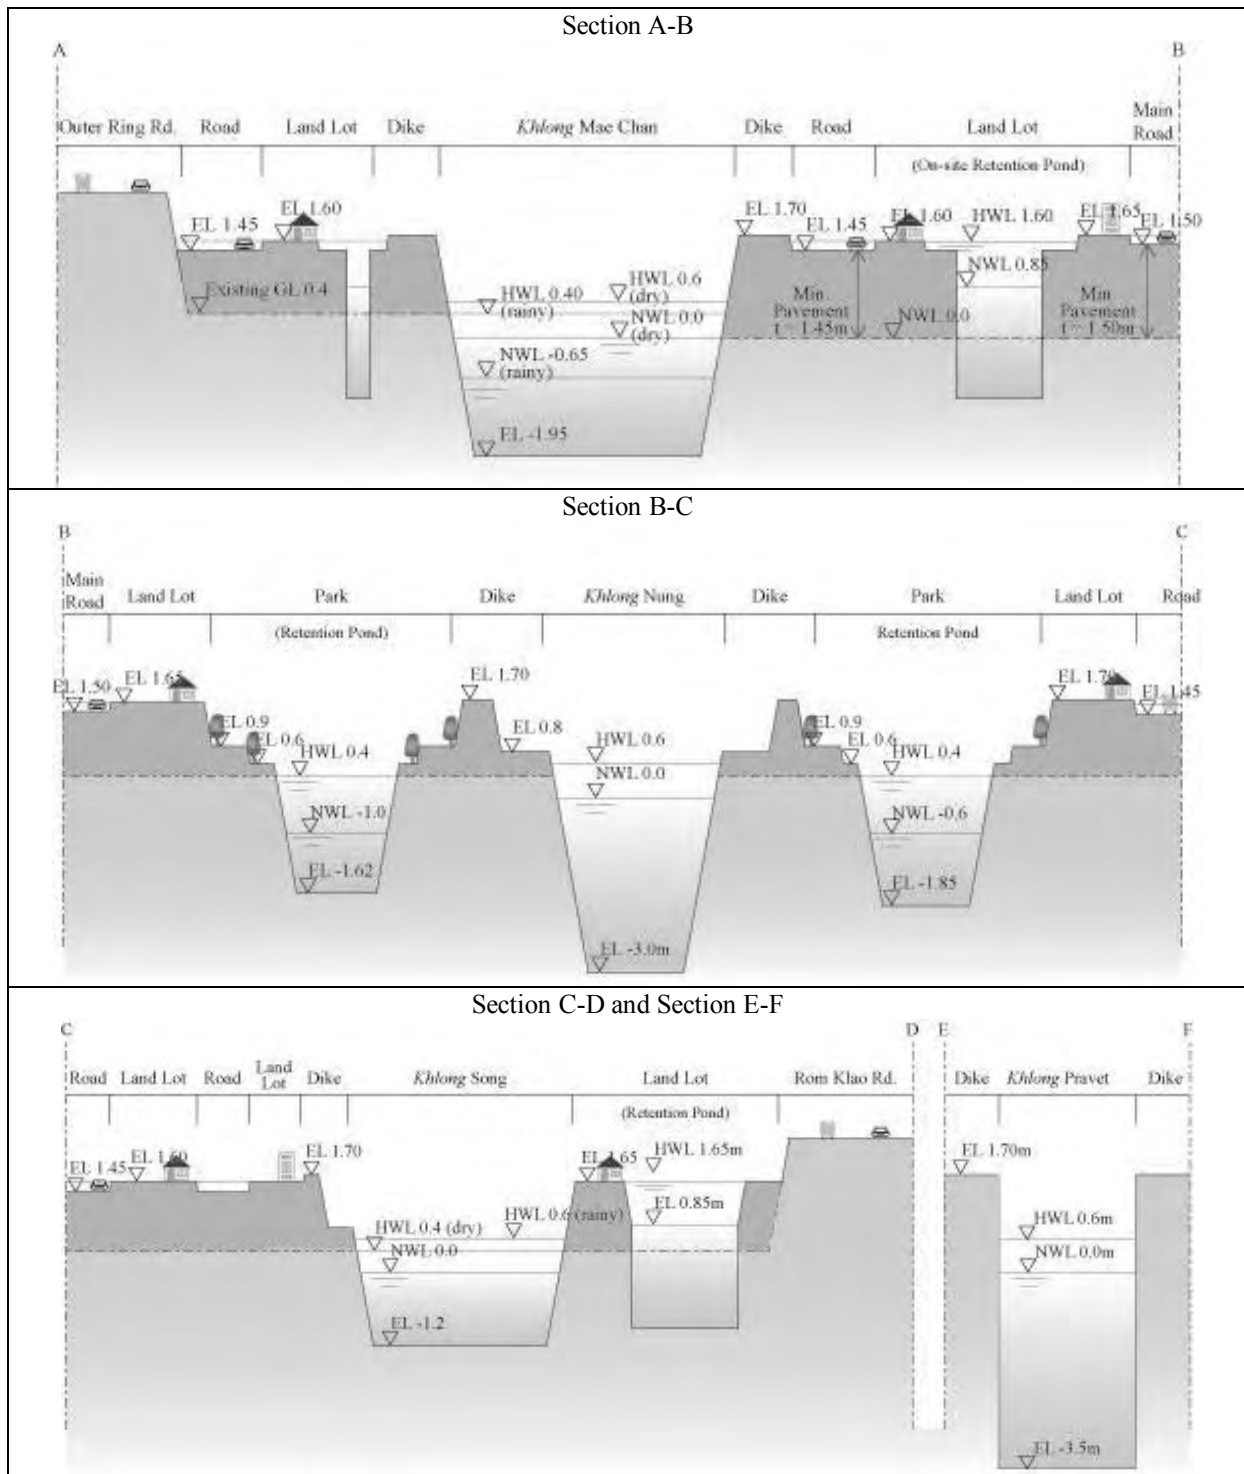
Typical Cross-sections of the Study Area (non-scaled)
